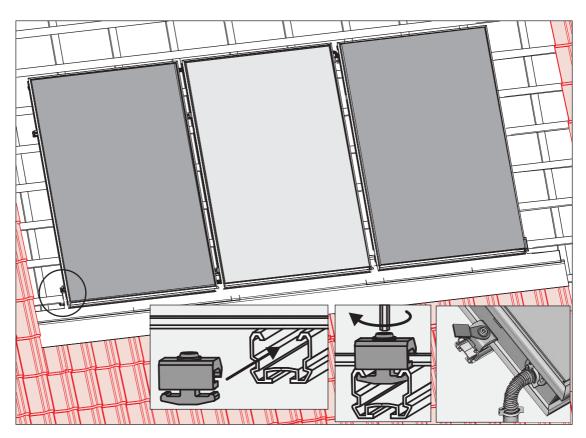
Insert the individual clamping blocks for the last flat solar panel and tighten down. Mount the clamping block with potential balancing terminal close to the return flow connection. Shown on a flat solar panel EKSV26P in drain-back system
